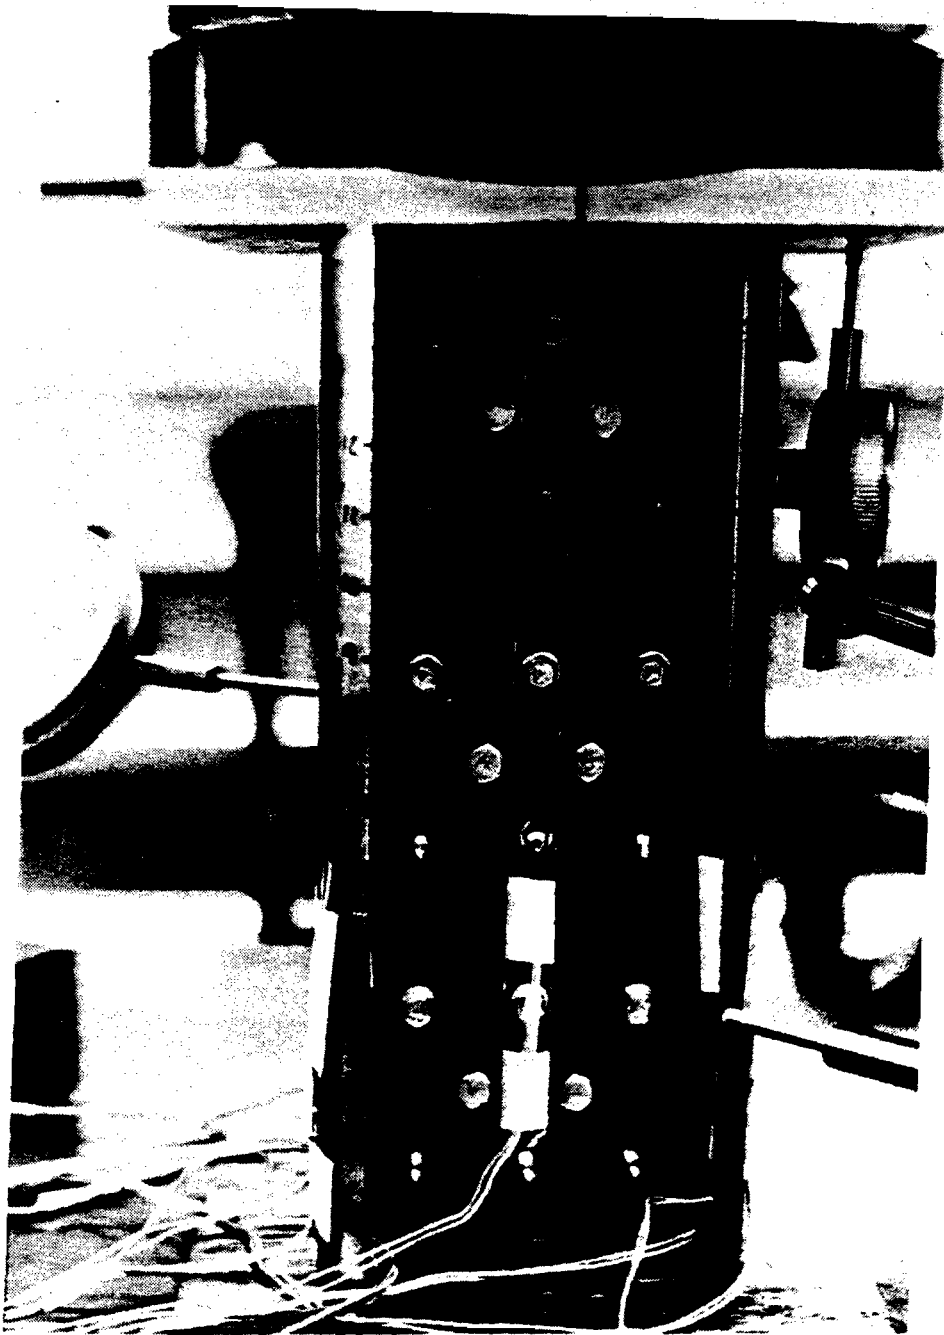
Attachment of Web Bracing to Stub Column Specimens
